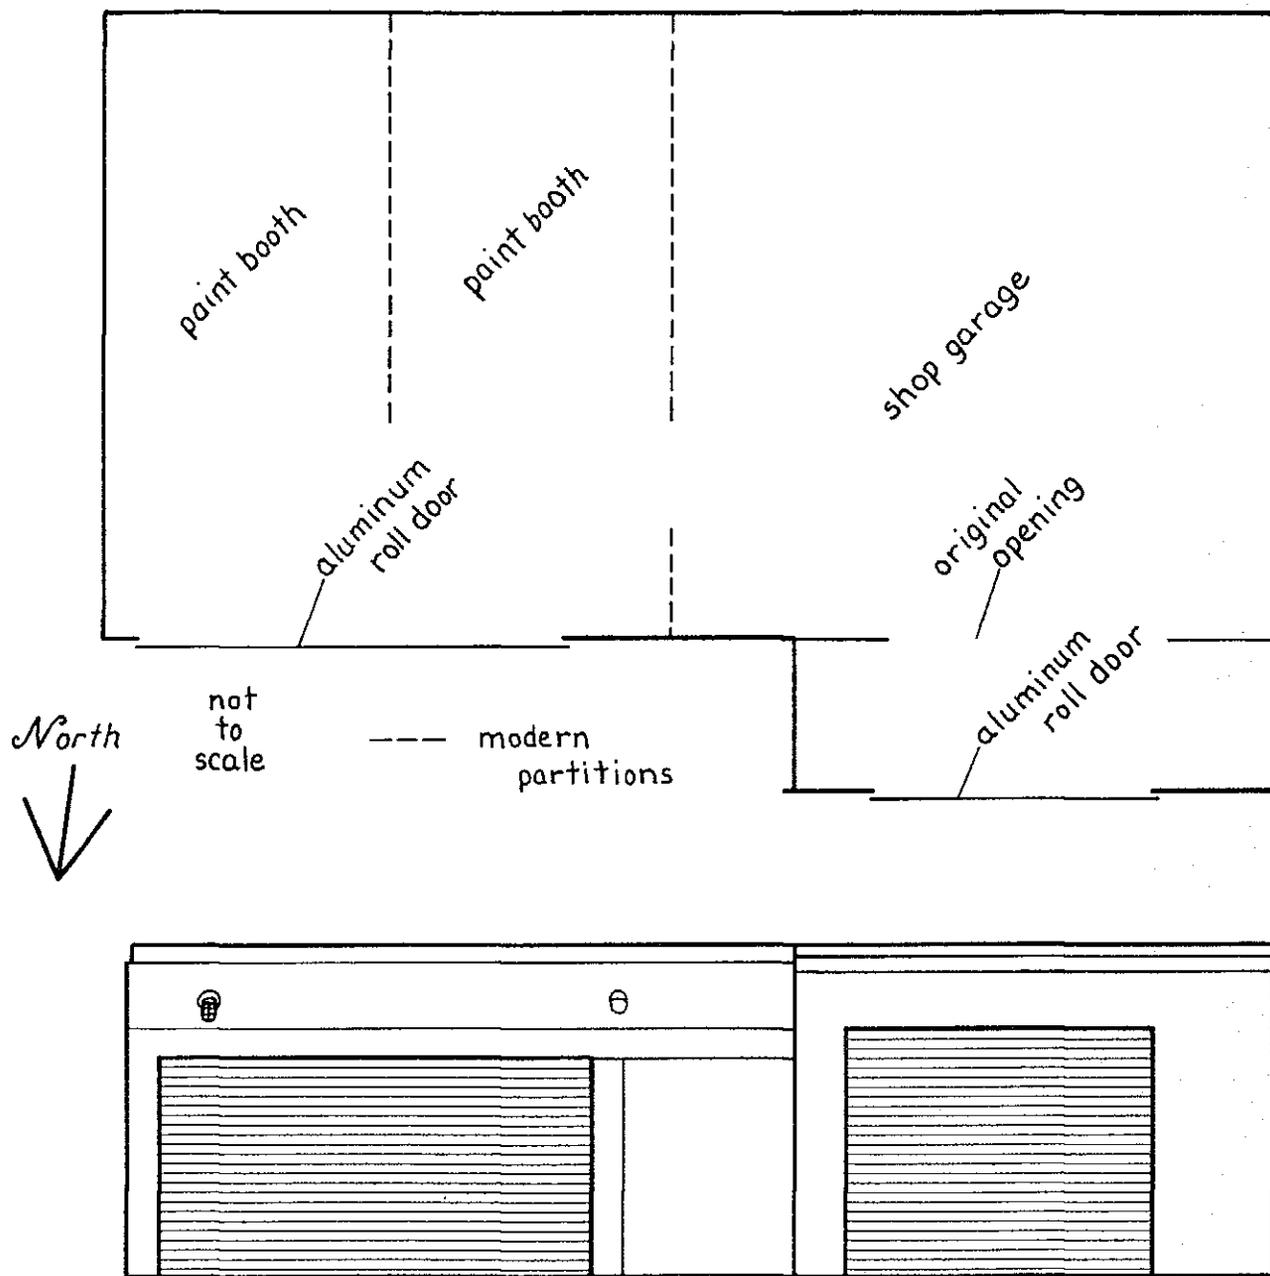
Field sketch of the floor plan and front (north) elevation of the former Sheriff's Garage.
